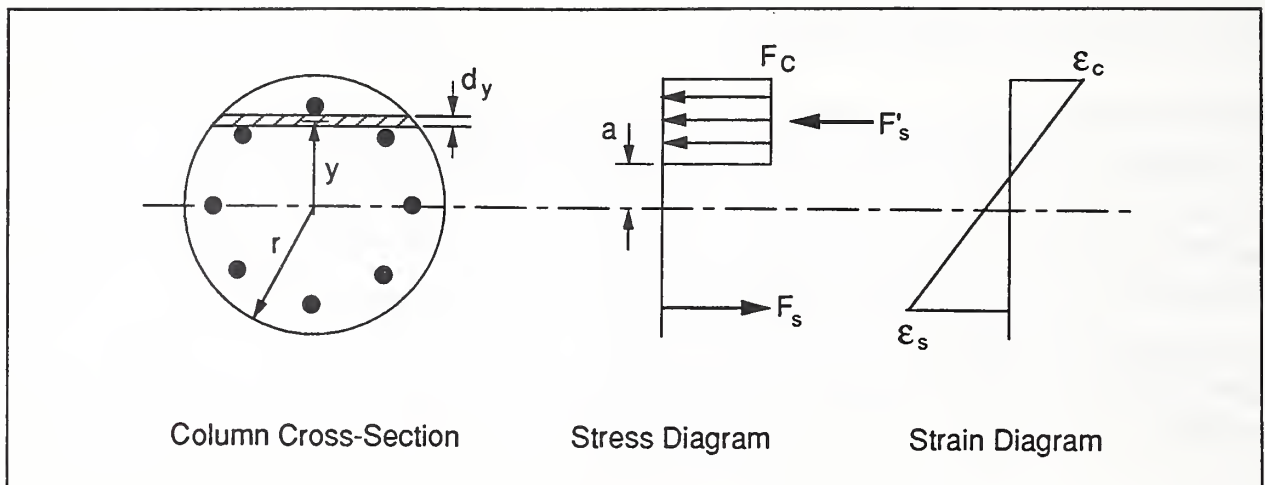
Circular Column with Circular Arrangement of Longitudinal Reinforcement
